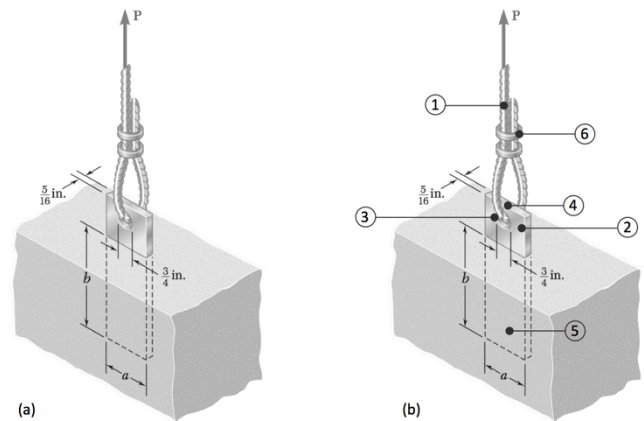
Structural Failure of Steel Plate Embedded in Concrete Block (a) Idealization Provided with Problem Prompt, (b) Student Identified Failure Modes. Adapted from Reference 1.
